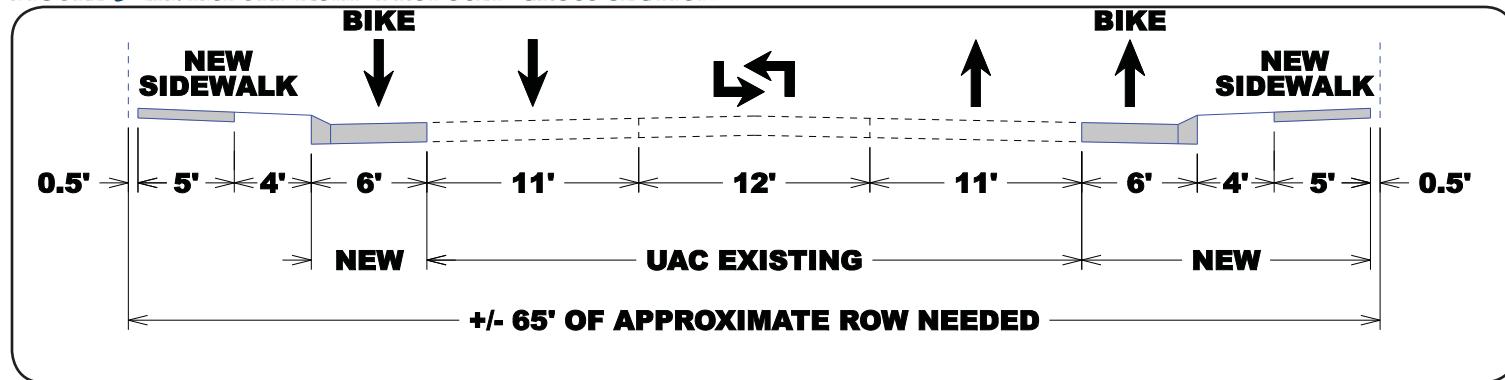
B. ASBURY ROAD PROPOSED CROSS SECTION FROM HILLCREST ROAD TO CLARKE DRIVE
